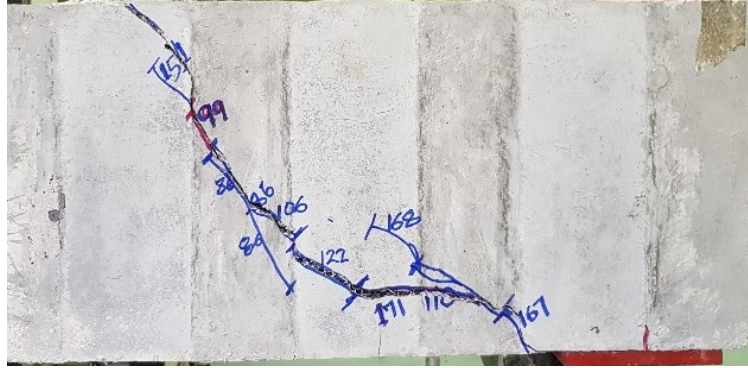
Crack patterns and failure modes for Specimen C-I-S.
